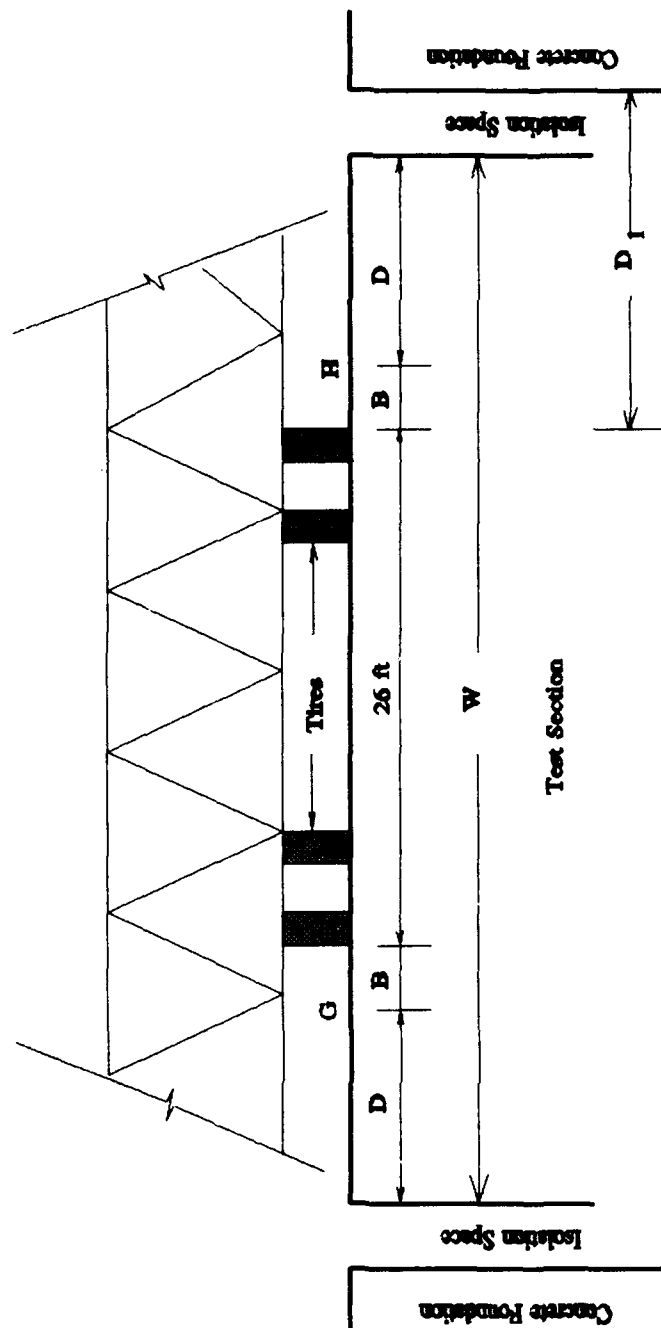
REQUIRED WIDTH OF THE TEST PAVEMENT
